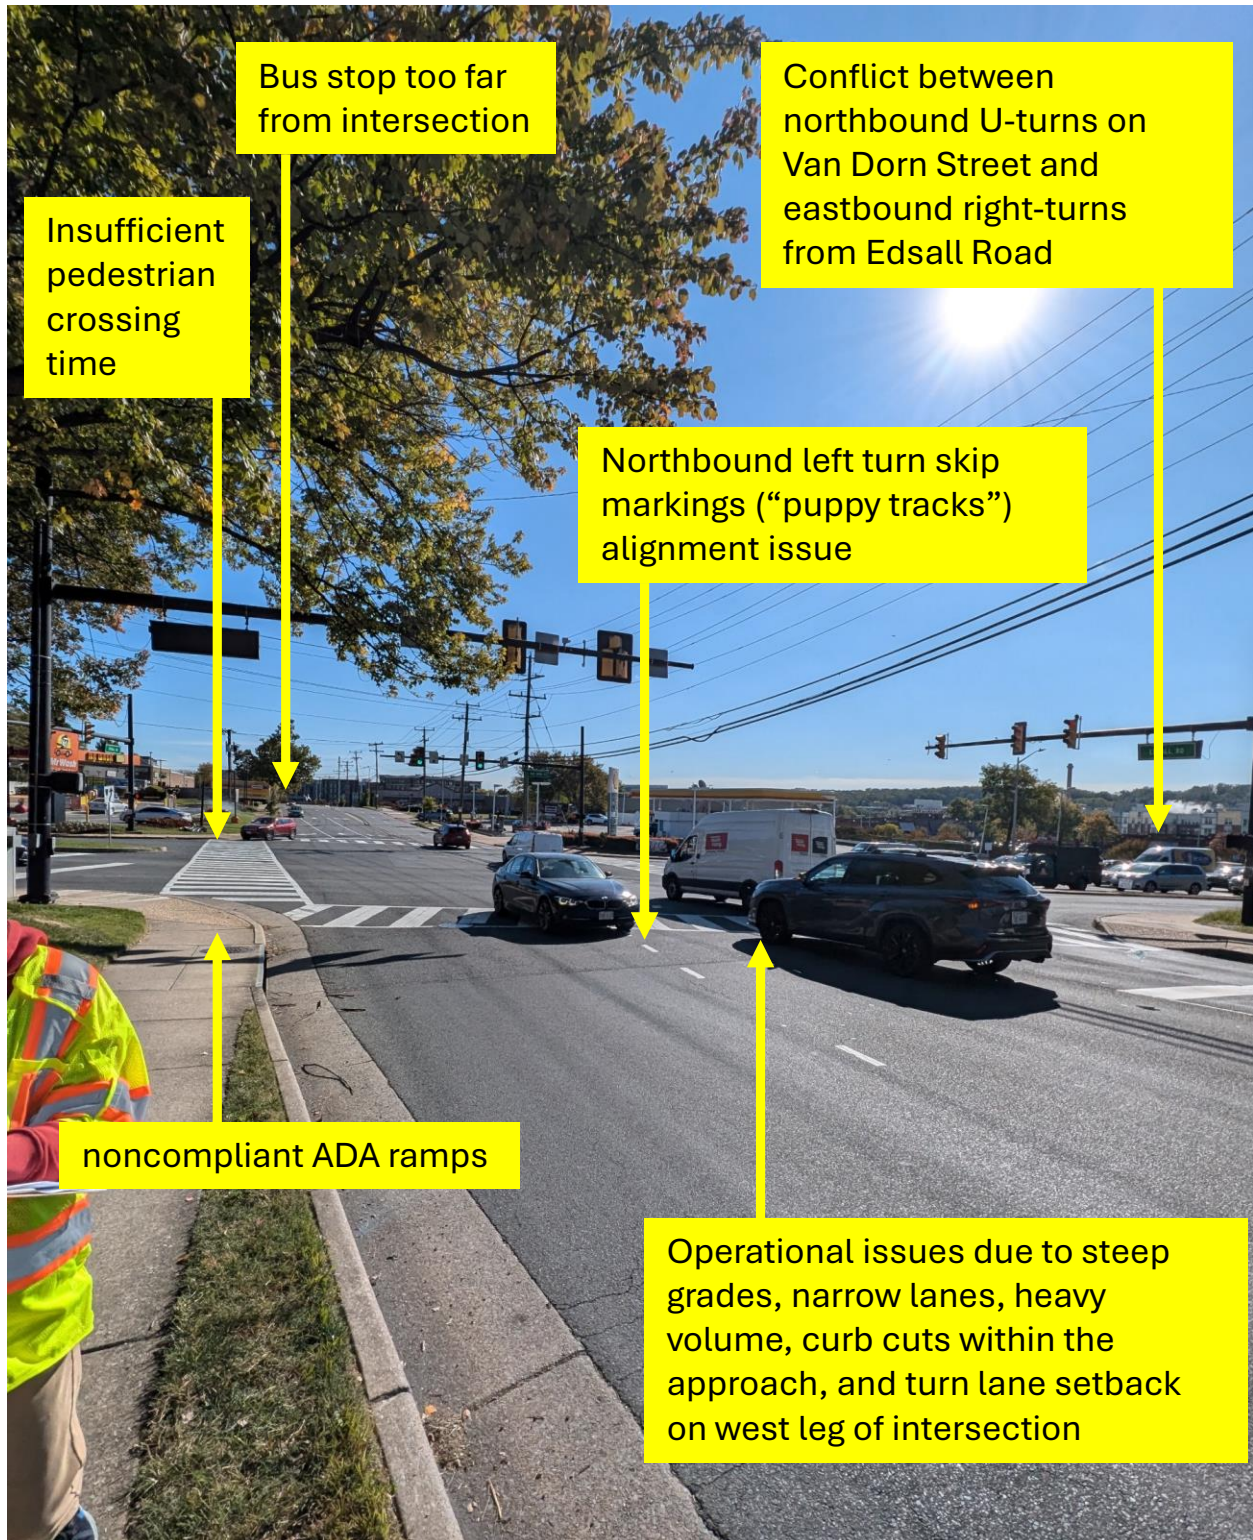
Edsall Road and S Van Dorn Street – northwest corner of intersection looking east
